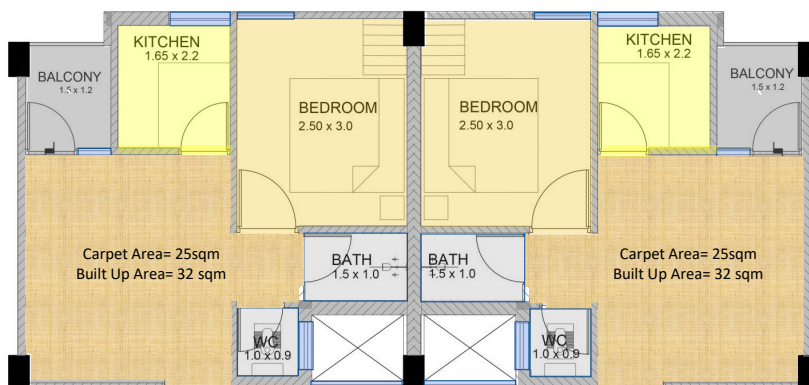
FIG: UNIT PLAN OF IN-SITU REDEVELOPMENT AT DISTRICT CENTRE, DILSHAD GARDEN
